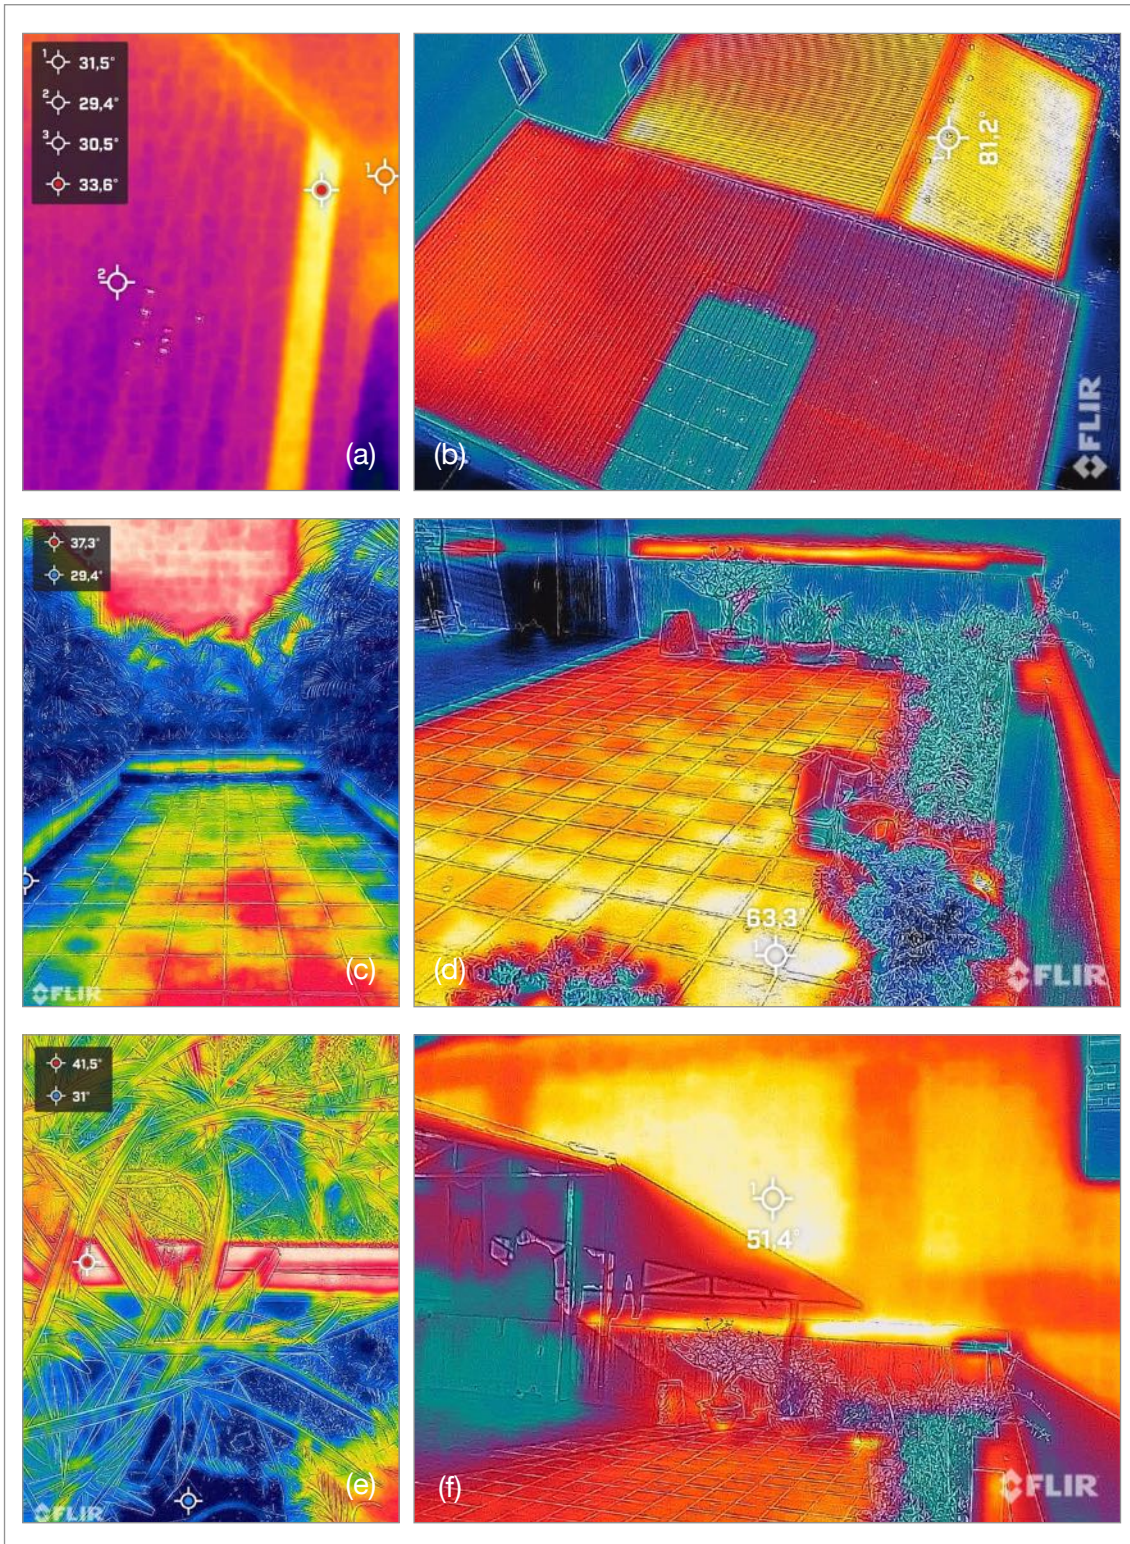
(a) Window Frame from Inside, (b) Sheet Metal Roof grey, (c) Roof Top after Greening, (d) Roof Top before Greening, (e) Detail of Plants and Construction, (f) Surface Temperature of West Wall to East Neighbour
